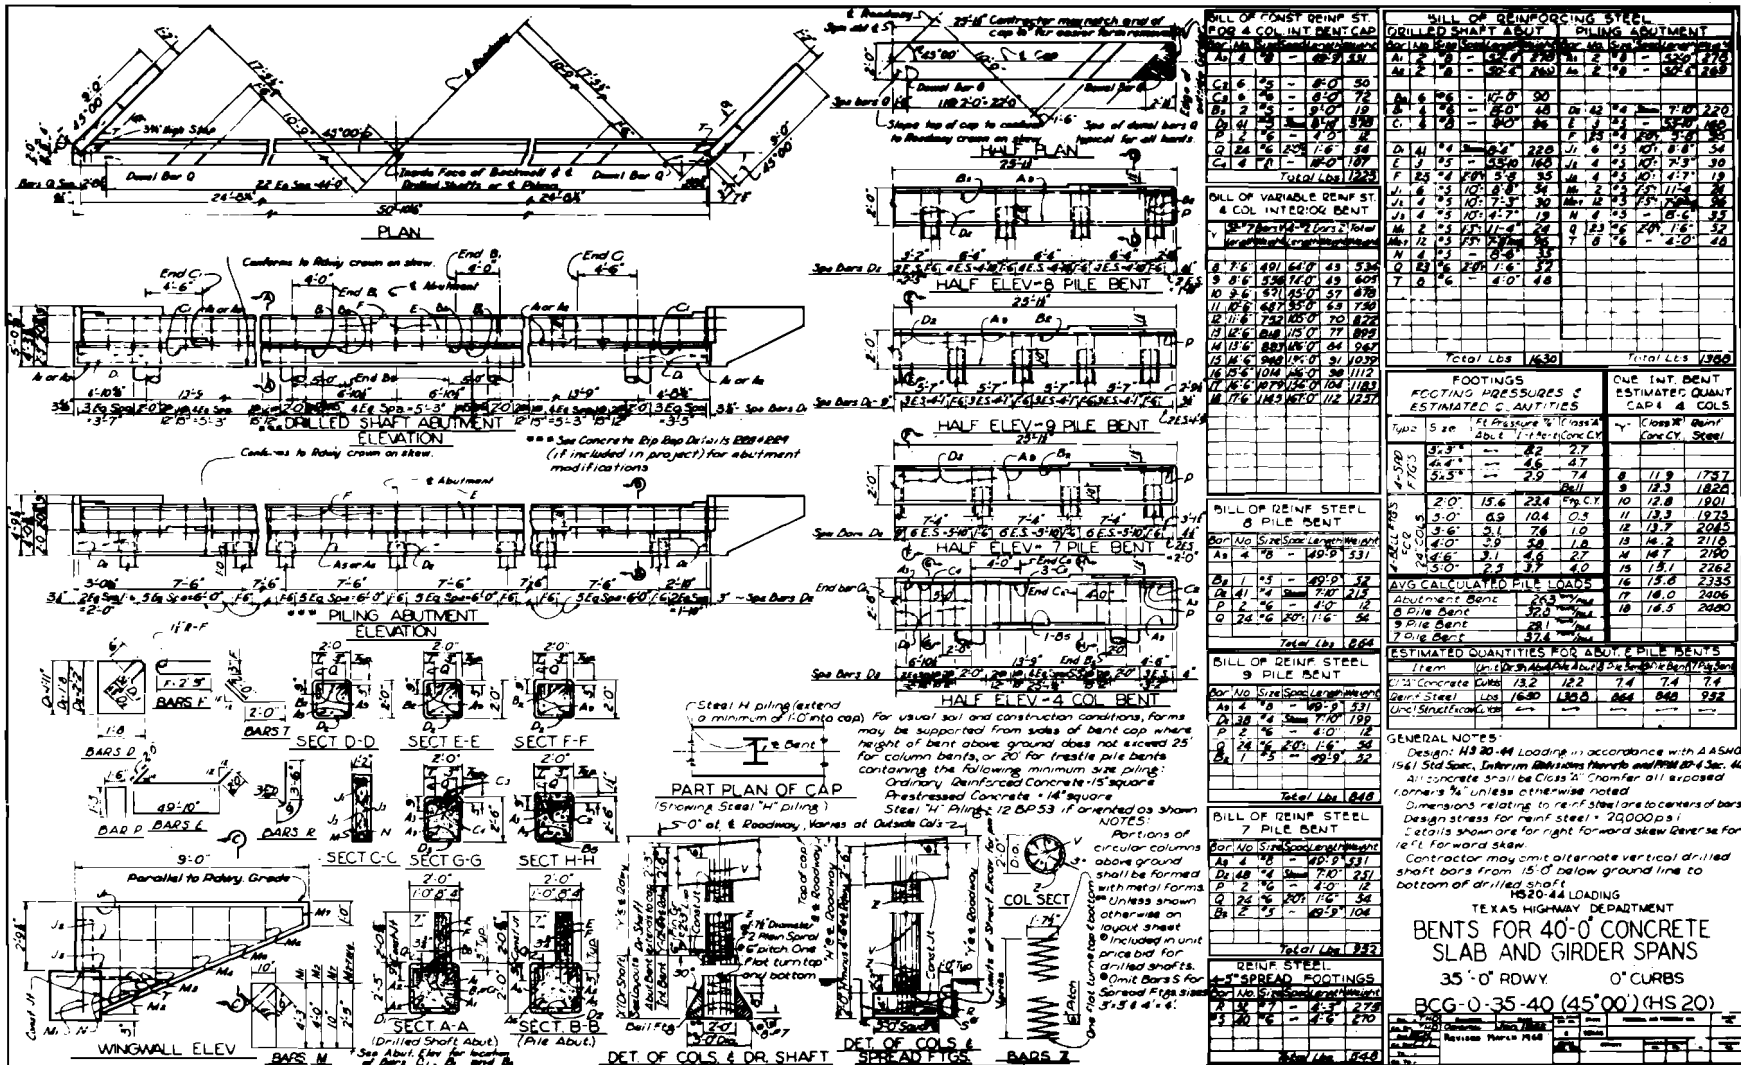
Texas Highway Department Plan Sheet, BCG-0-35-40 (45°-00').
